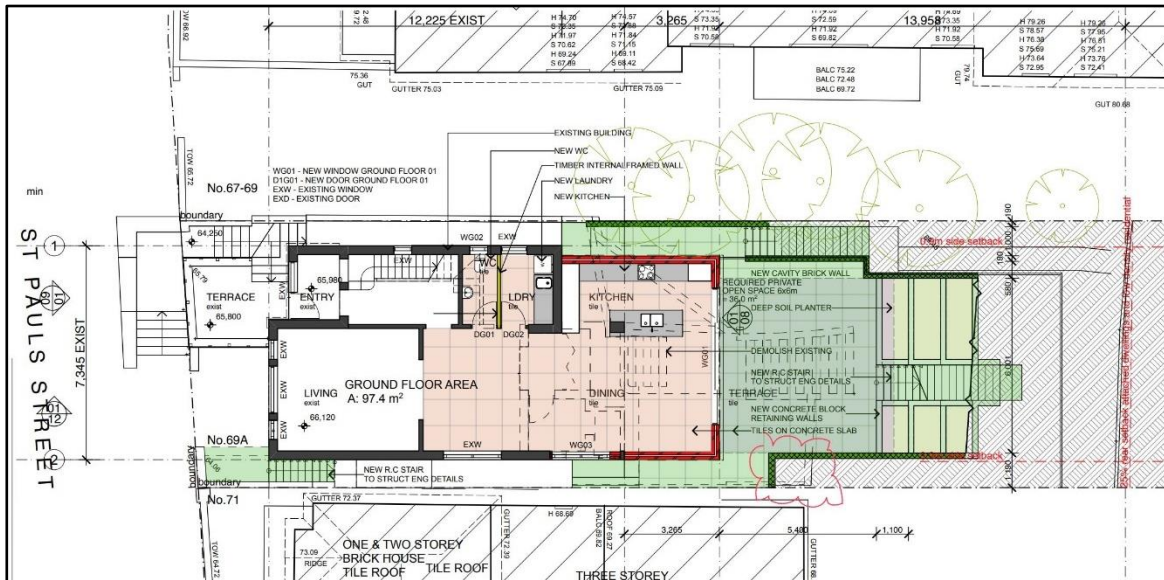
Ground Floor Plan (Rev B), 2/11/2023 (Fortey & Grant Architecture)
